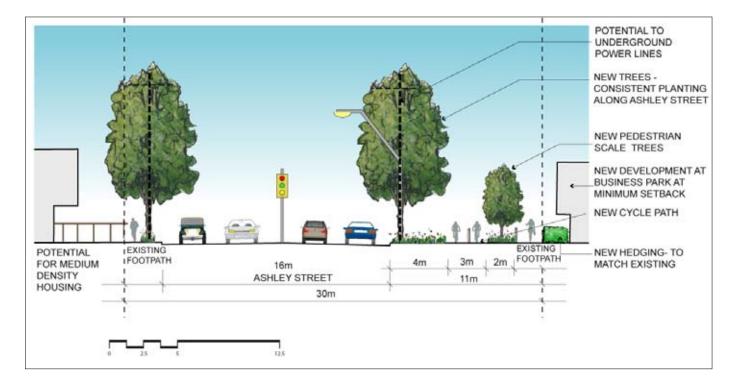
Proposed Section - view looking south down Ashley Street at Central West Business Park entrance.
